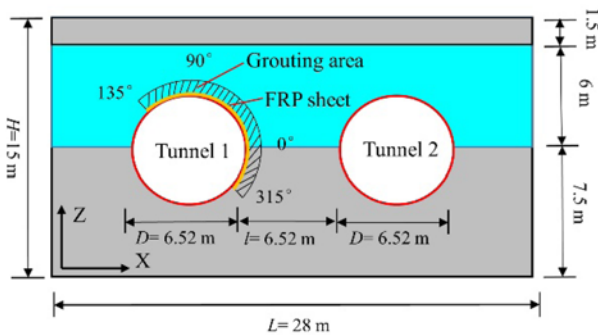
Diagrammatic Drawing of Composite Reinforcement Method for Tunnel 1 Surroundings
